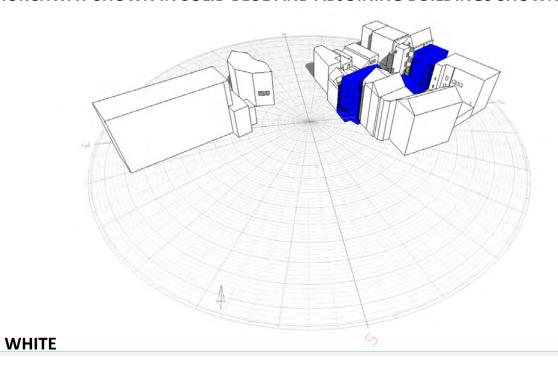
MASSING "AS PROPOSED" AT 53-55 CHALTON ST AND 60 CHURCHWAY SHOWN IN SOLID BLUE AND ADJOINING BUILDINGS SHOWN IN
